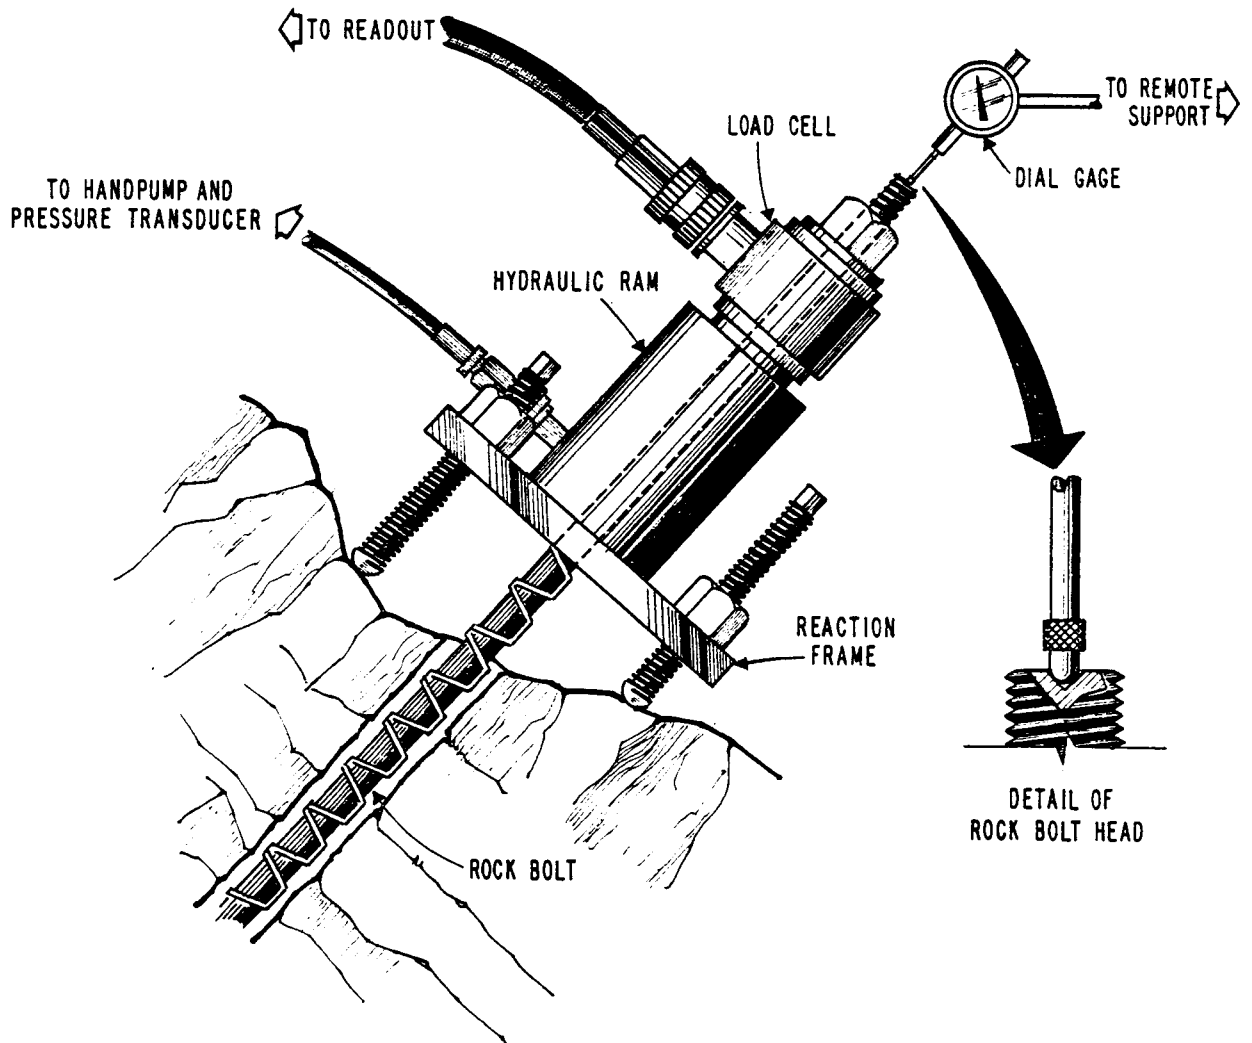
TYPICAL ROCK BOLT ANCHOR PULL TEST SCHEMATIC
